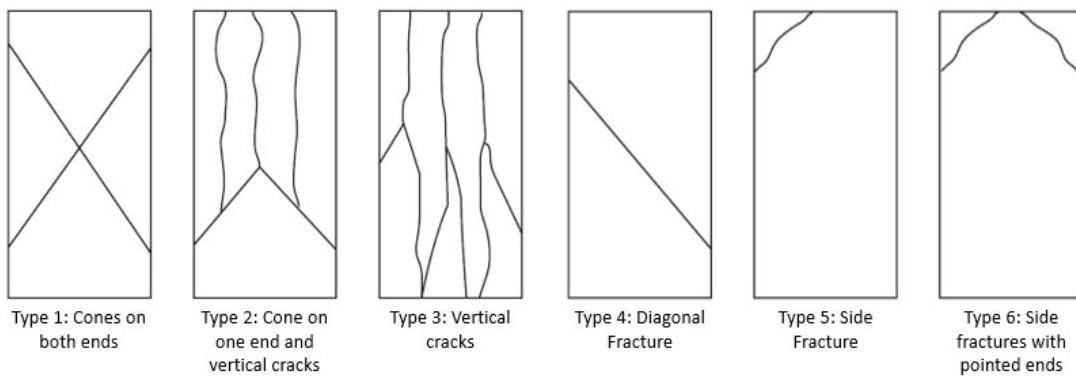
Concrete Cylinder Failure Modes ([Manlouk & Zaniewski, 2011](#))
